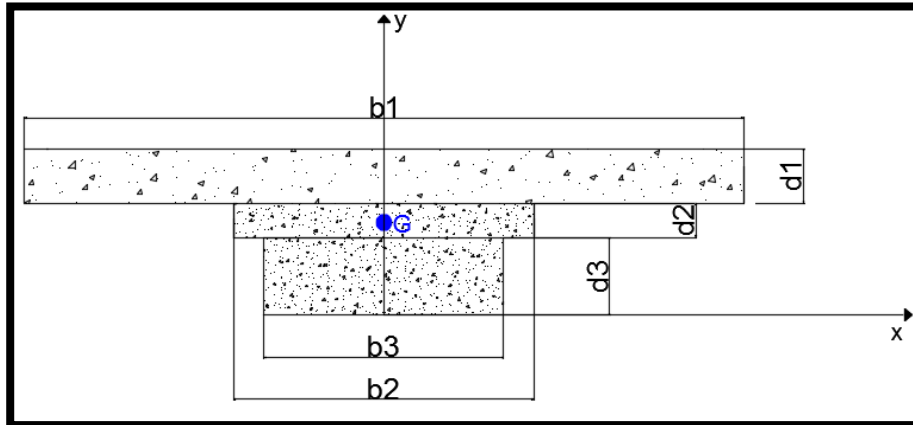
Design of the cross section of the consolidated floor slab used for the design.
